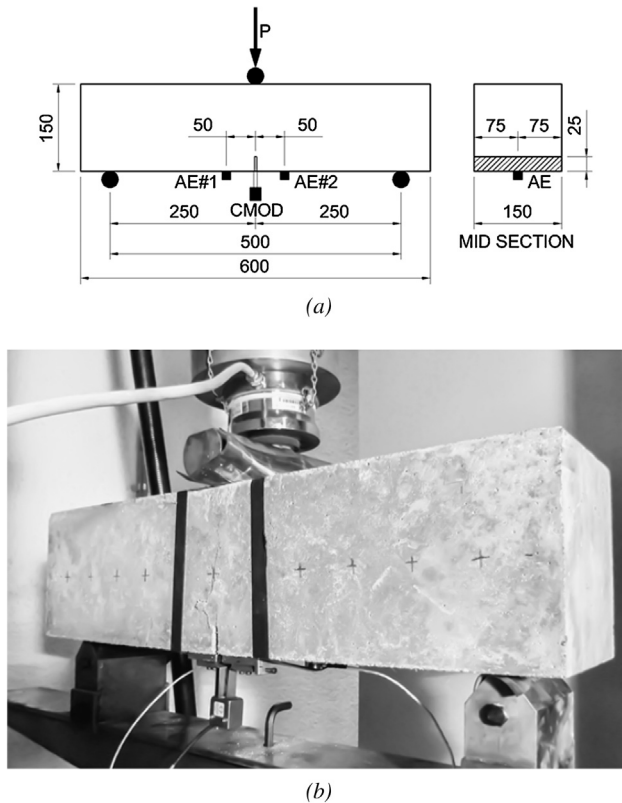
Three-point bending test setup: (a) beam geometry (distances in mm) and (b) sensors arrangement.
